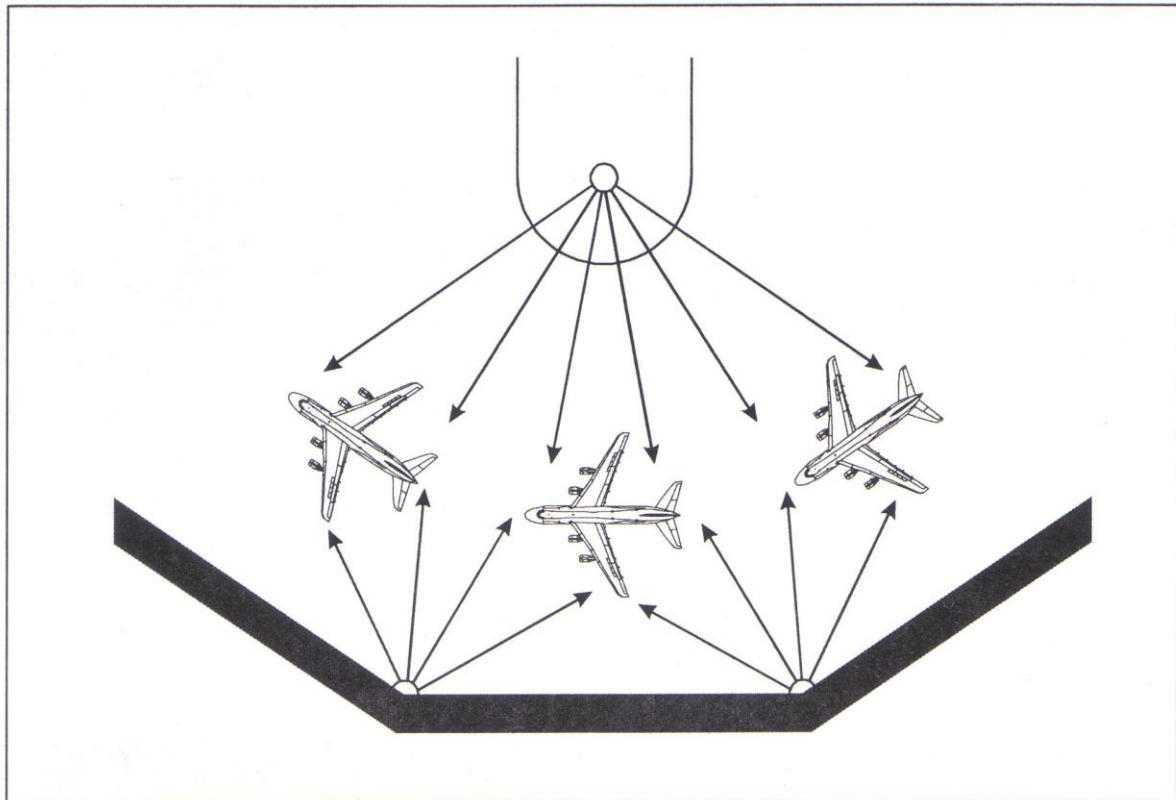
Typical floodlight arrangement and aiming for parallel parking
